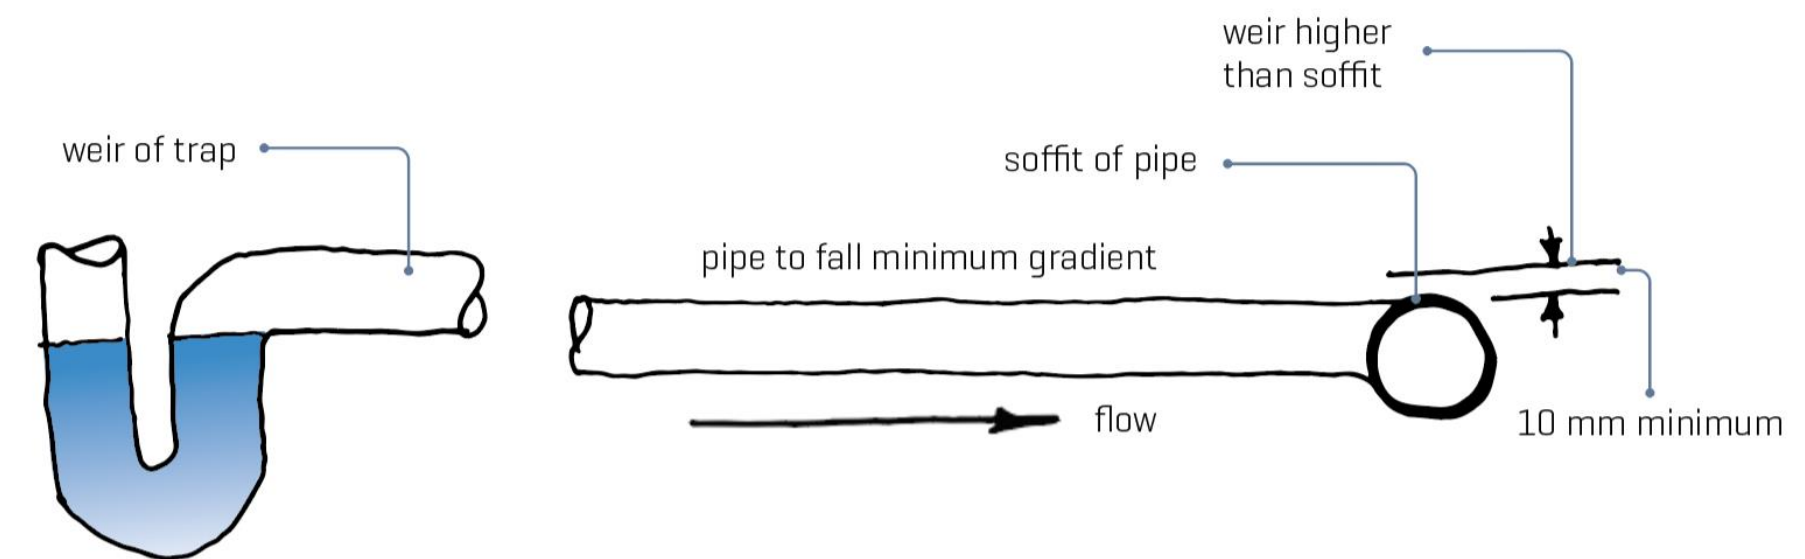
The weir of the trap must be higher than the soffit of the pipe to which it is connected.
